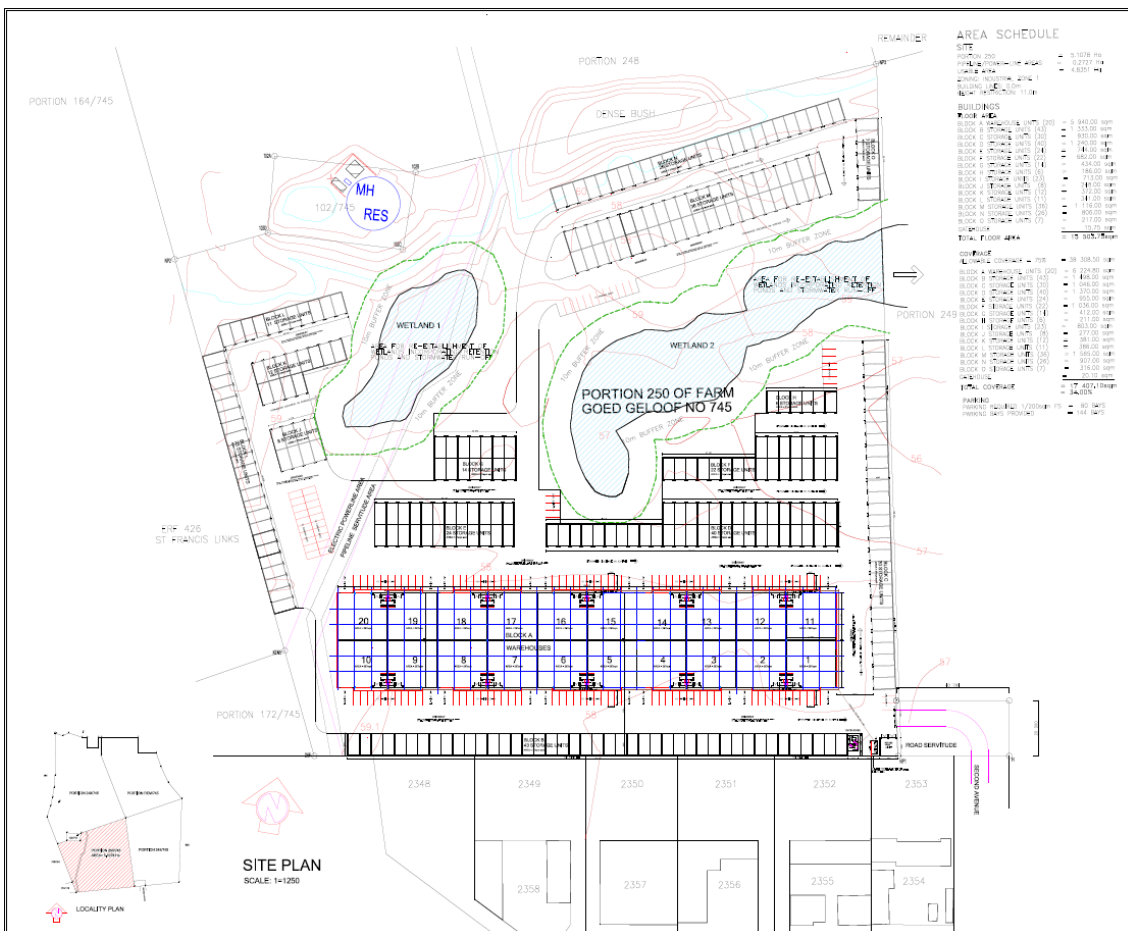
Site Development Plan for Alternative Layout 1 (Preferred Layout).
